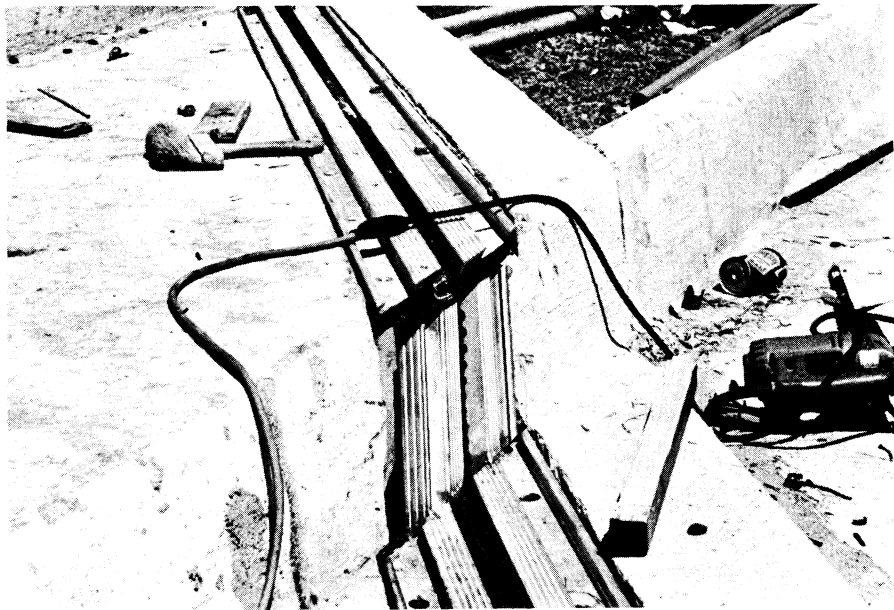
Appearance of the joint at the face of a sidewalk curb on the Duke Street bridge.
